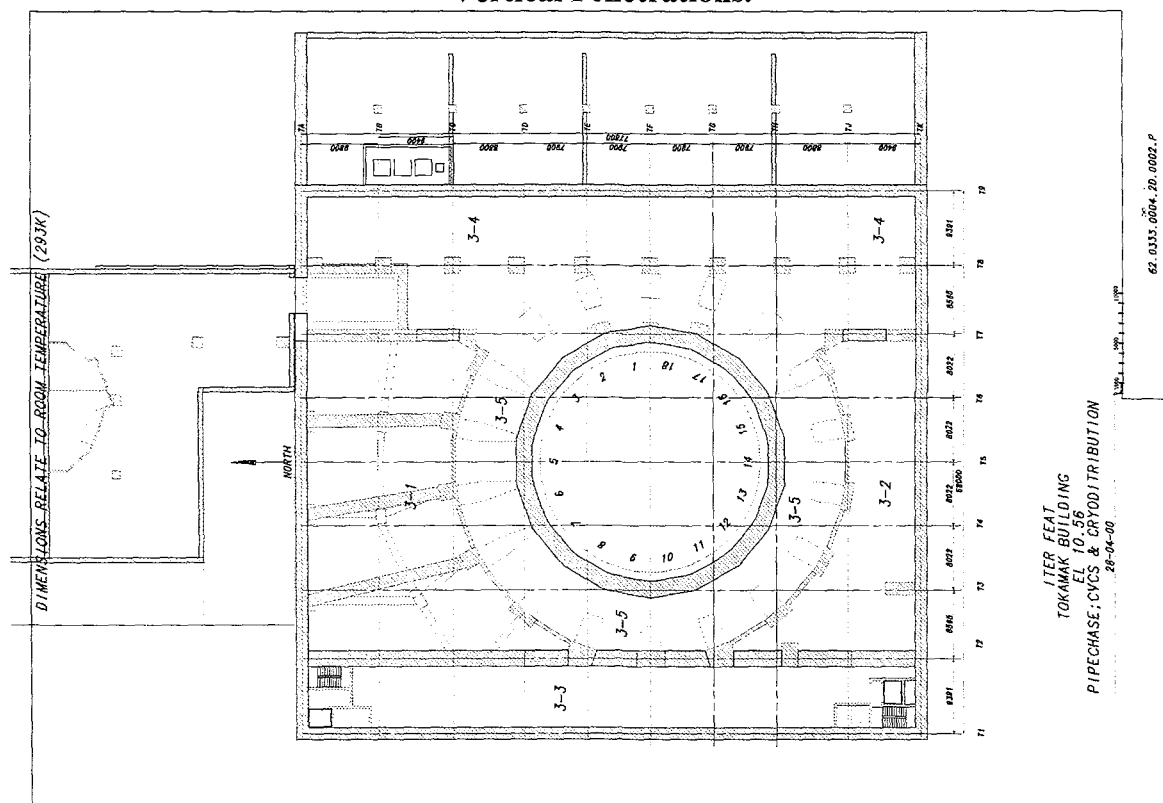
(b) Tokamak Building Floor Plan at the TCWS Level Showing Vertical Penetrations.
